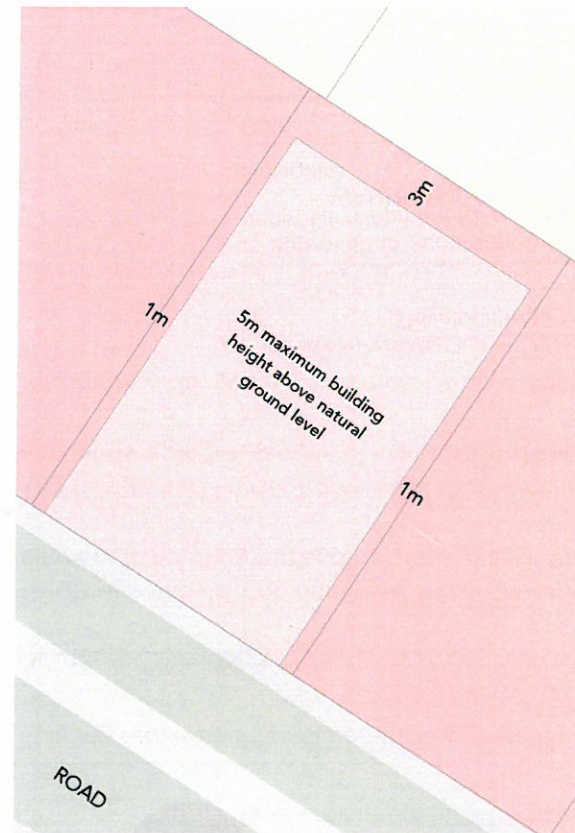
Conventional Residential Lots Building Envelope (Green Ridge)
